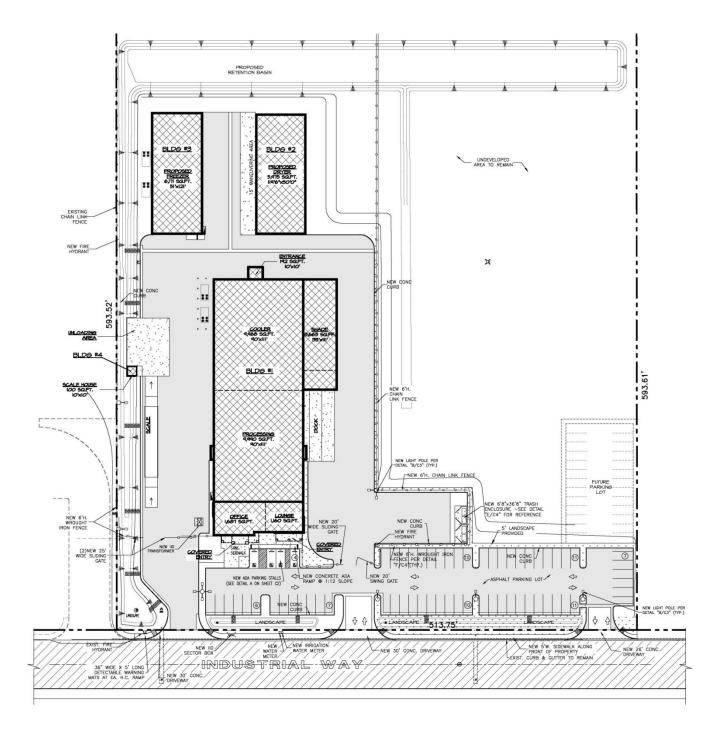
B: CONCEPTUAL SITE PLAN
